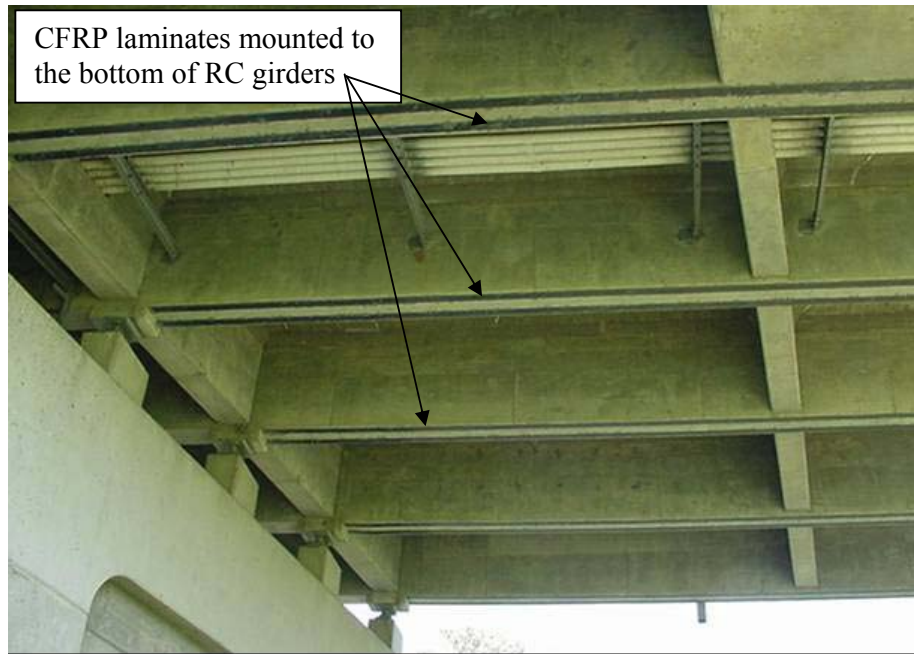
Girders in Span 6 strengthened with CFRP laminates.
